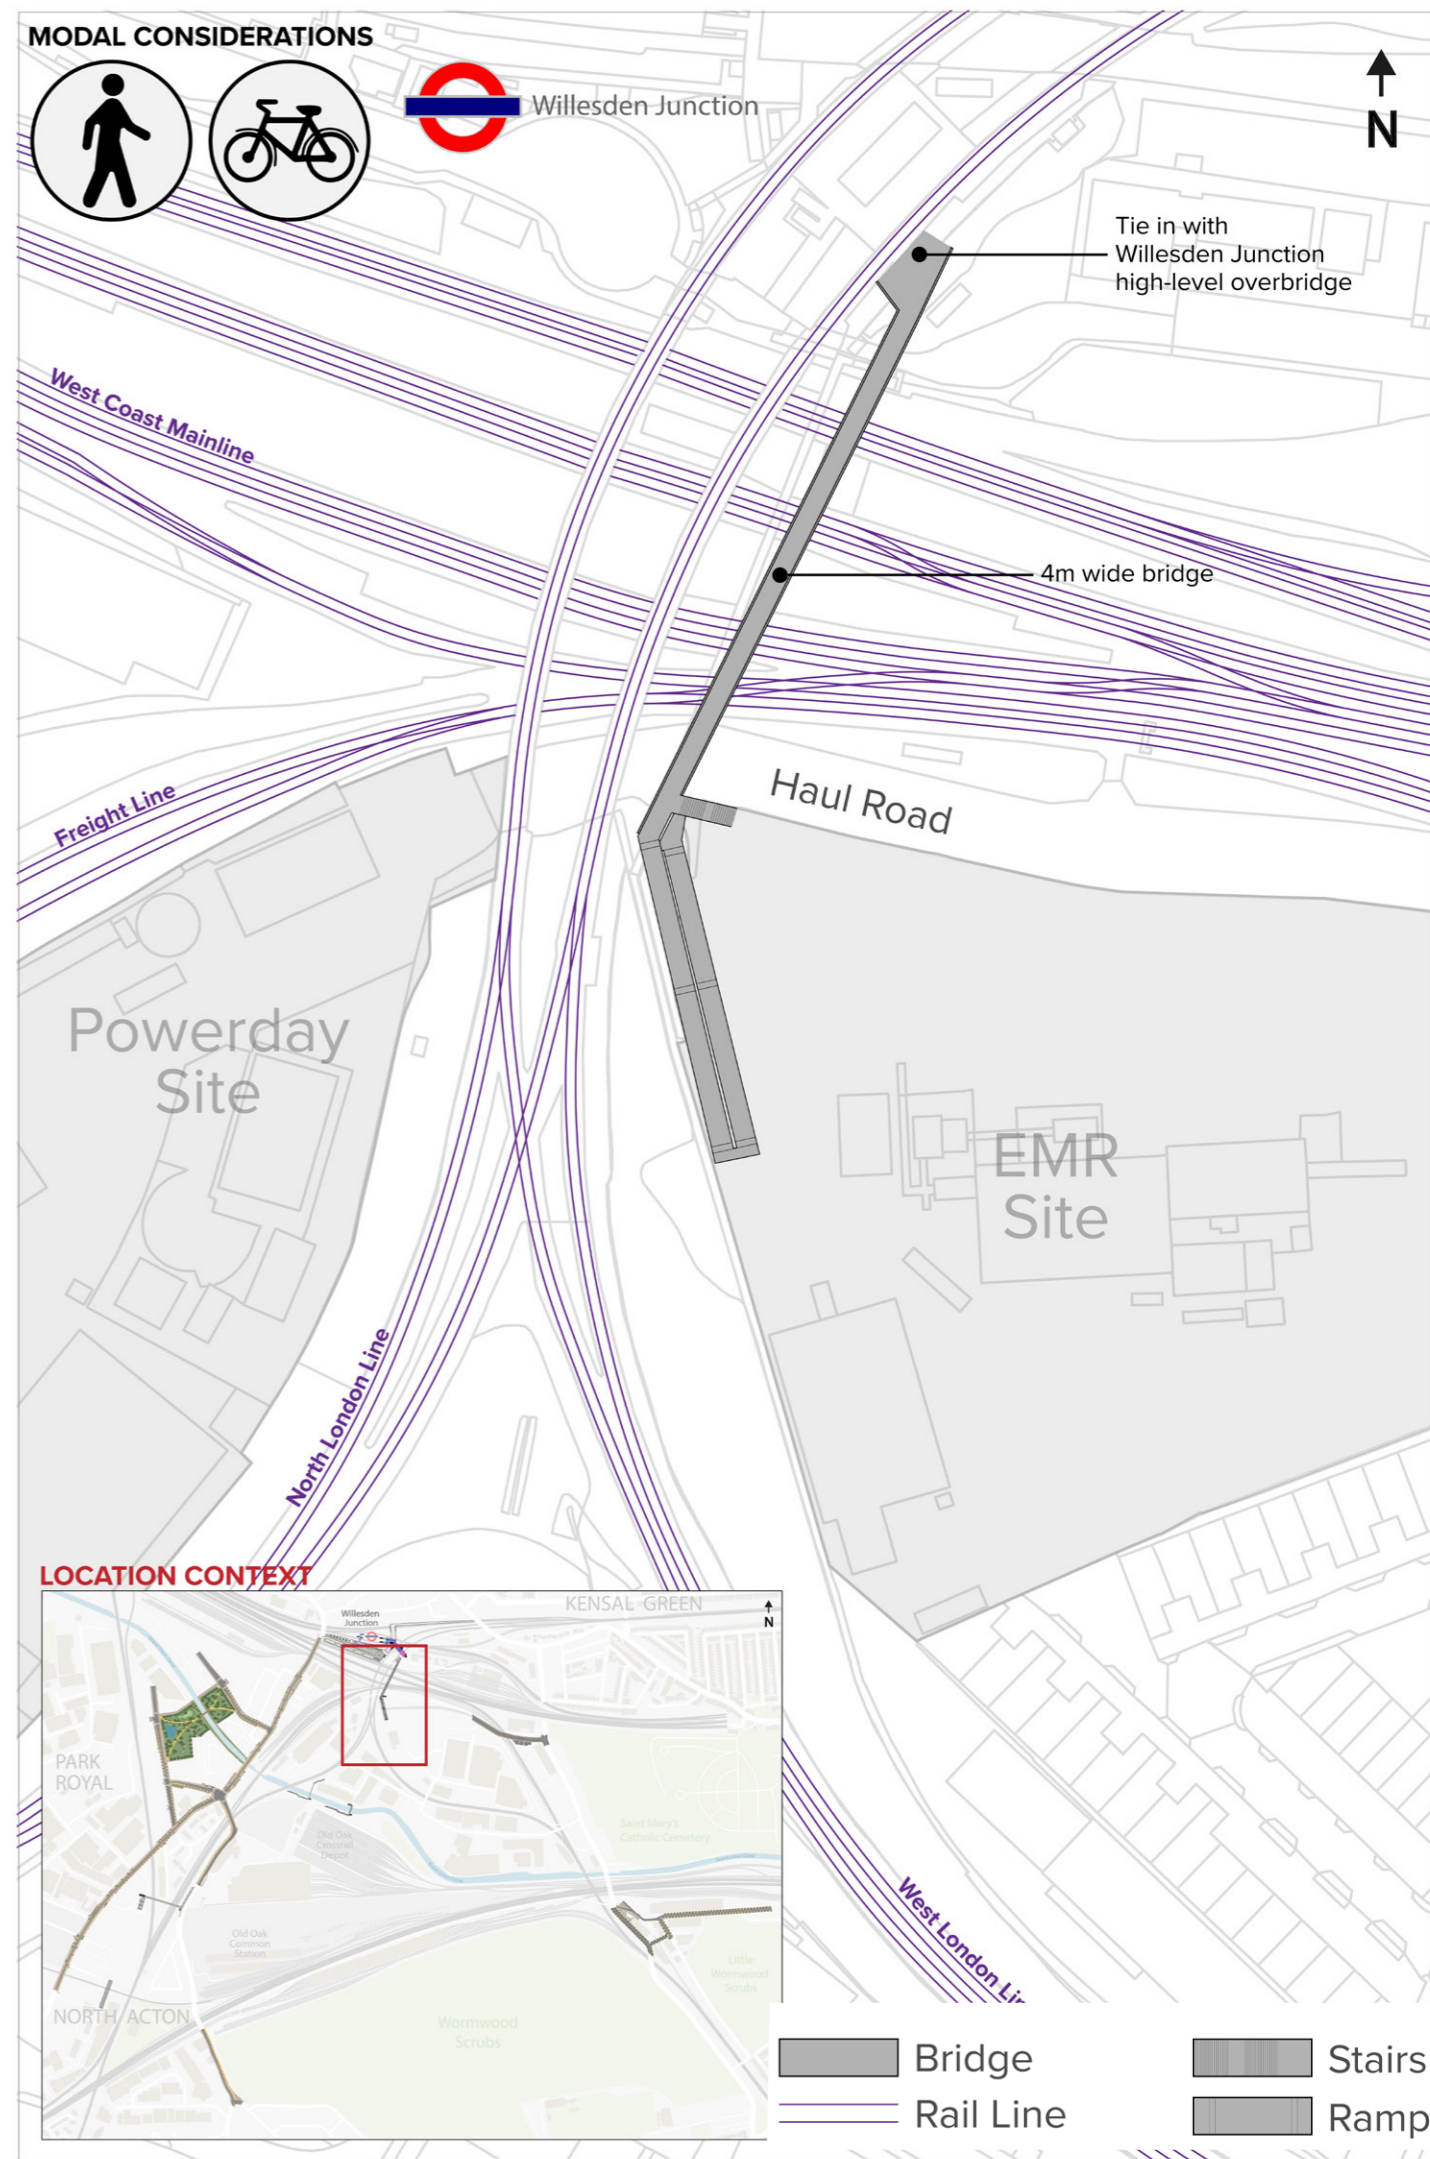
Intervention 11a, proposed bridge with stairs and ramp
